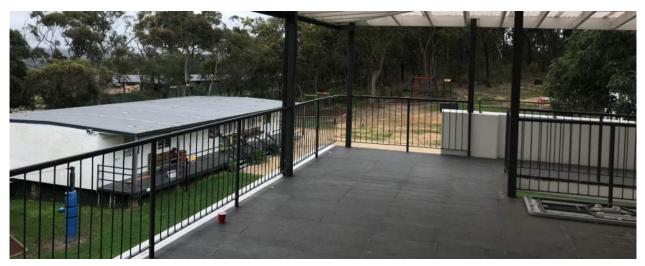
Upper Level of existing Chisholm House looking north-west (Source: City Plan)
